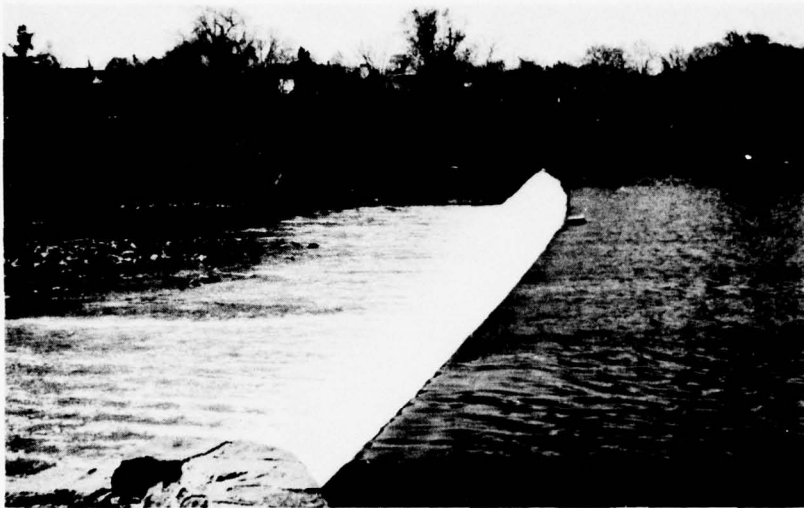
General view from left bank toward right abutment and canal intake on right bank
